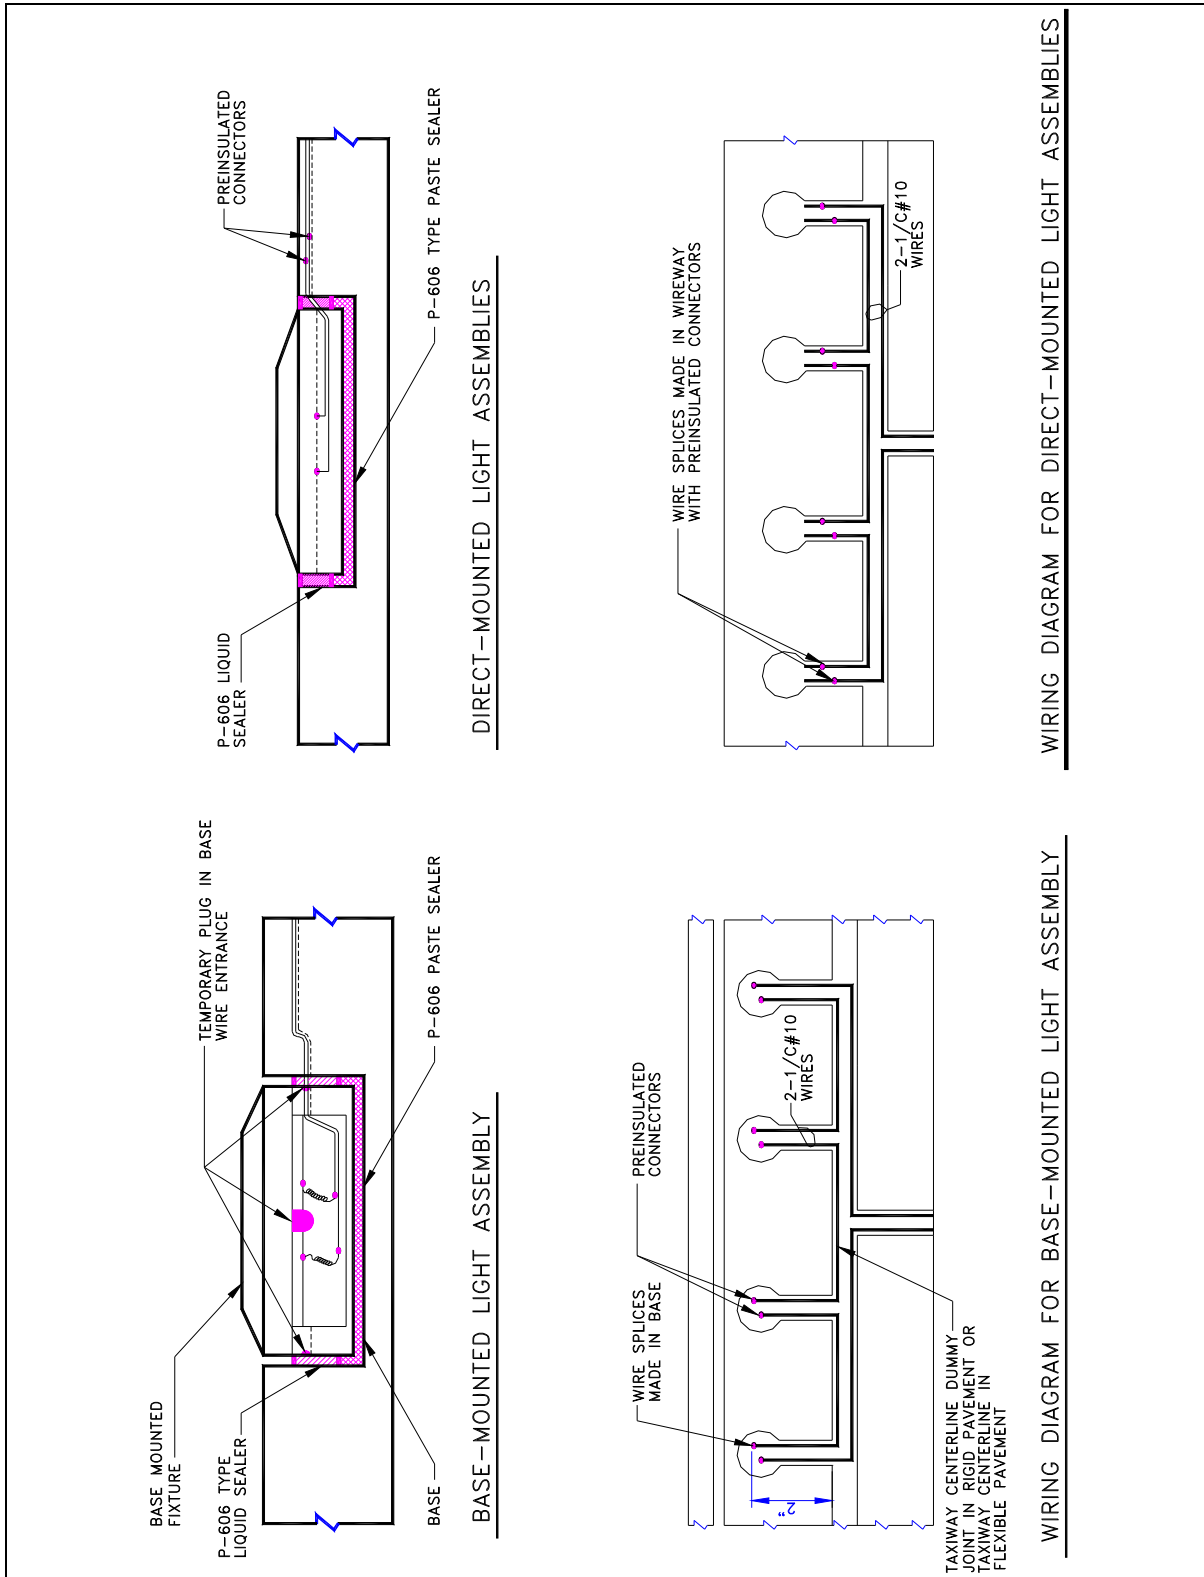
Wiring Details for Direct- and Base-Mounted Taxiway Centerline Lights.
